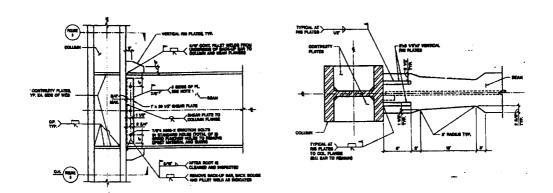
Rib-Reinforced Connection Details: Specimen COH-1
